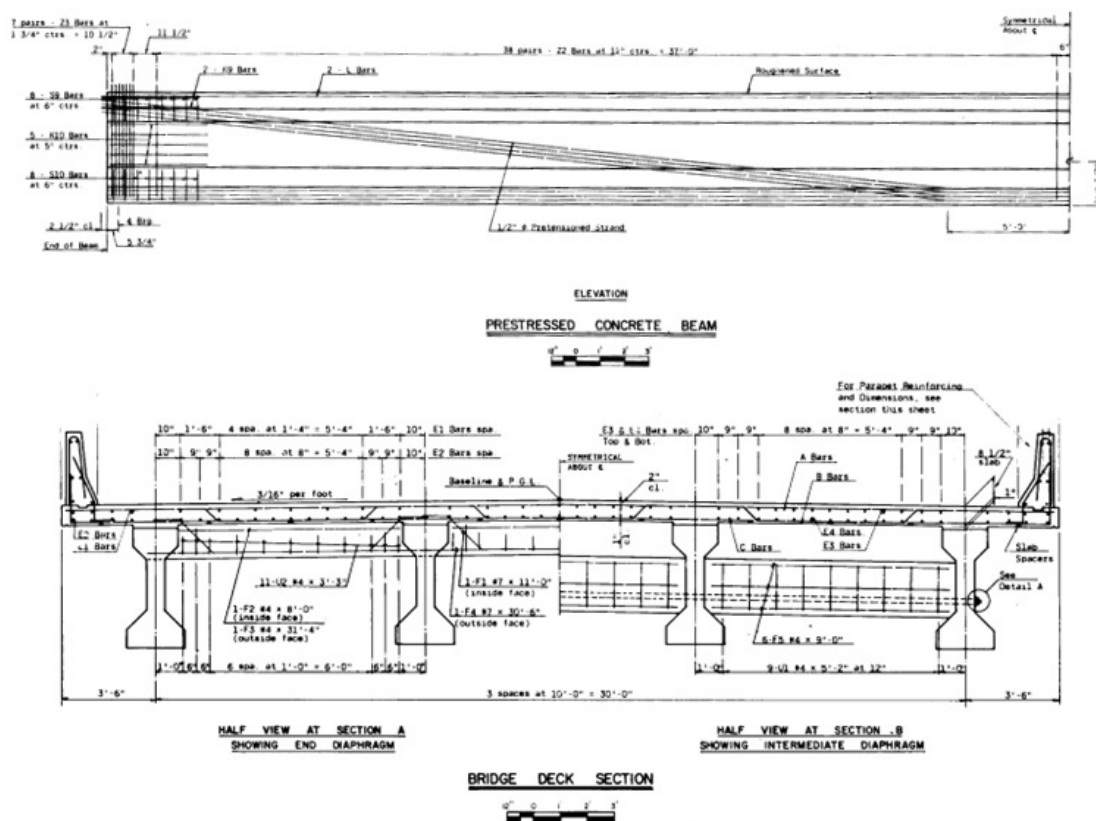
Example PC bridge section and main girder elevation views (reprinted with permission from USACE). Girders with bearing spacing of 23.8 m (78.04 ft) and girder spacing of 3.05 m (10.0 ft).
